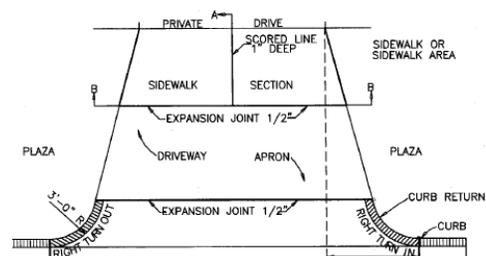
Wilmington standard driveway detail (SD 8-02)
